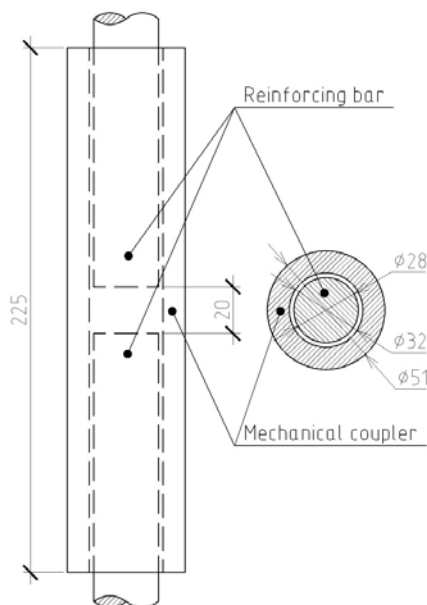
Schematic view of reinforcing bars spliced with a crimping coupler system designed to withstand tensile and compressive loads.
